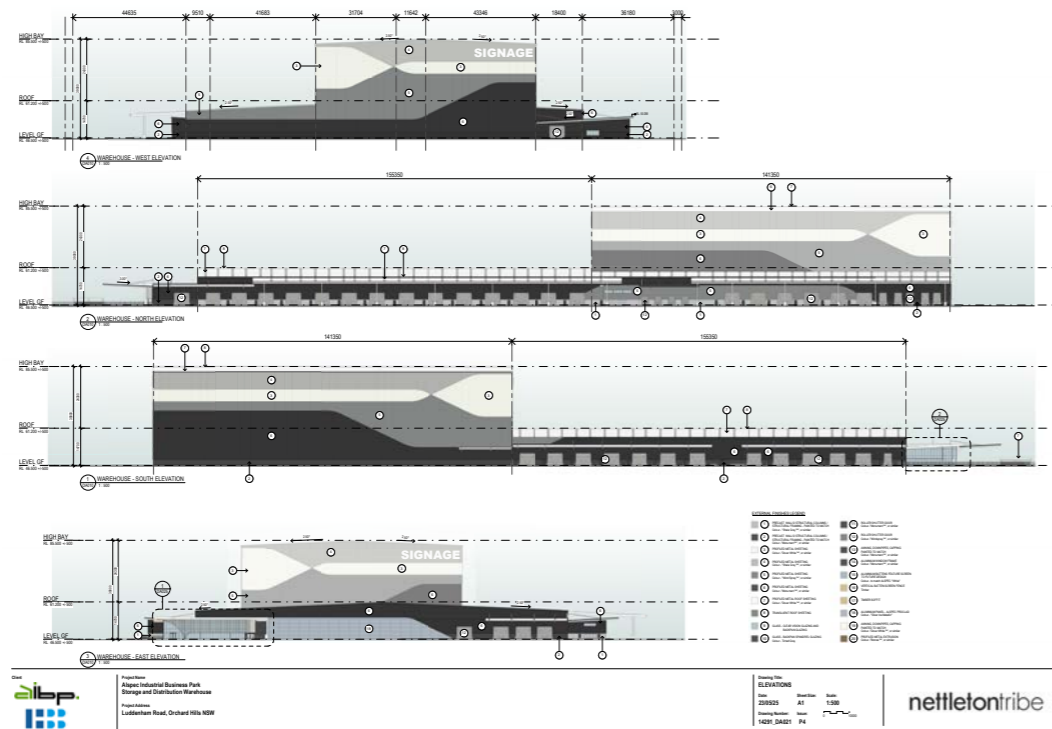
Building Elevation - Sheet 1 (Source: NettleonTribe)
